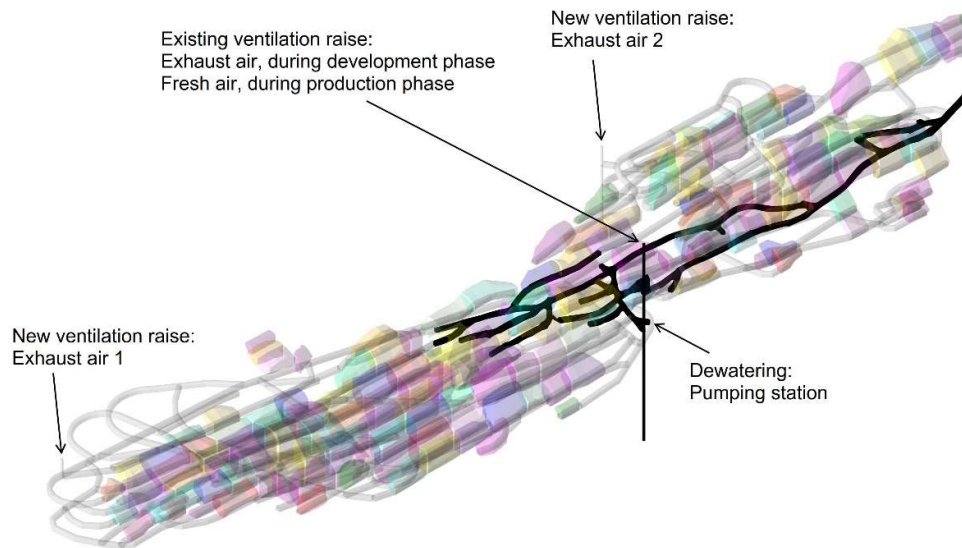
Hautalampi ventilation raises and dewatering pumping station.
